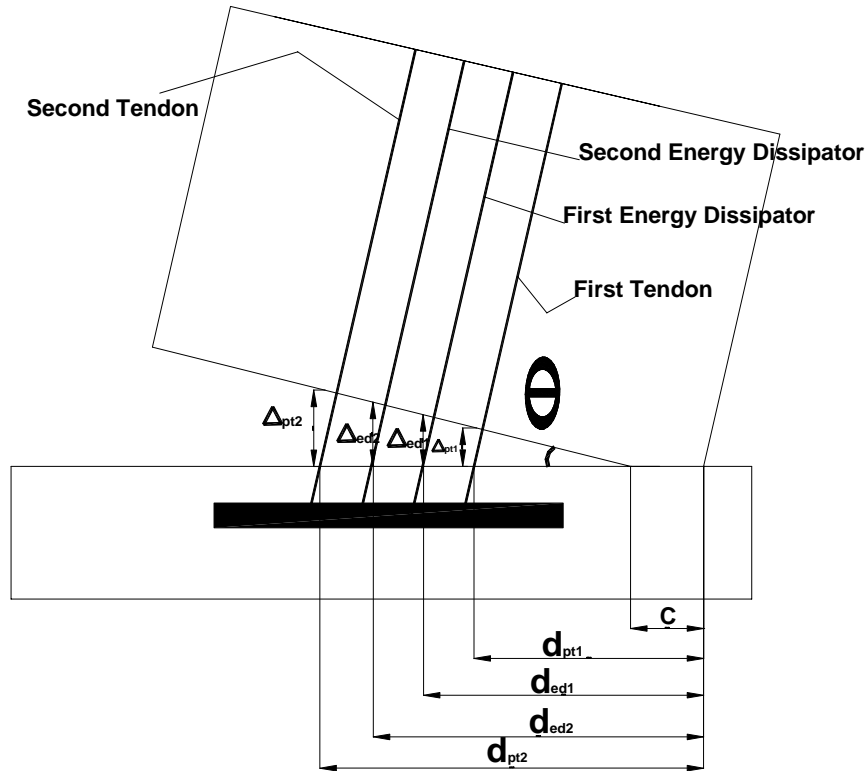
Elongation of tendons due to opening gap between wall-foundation interfaces.
